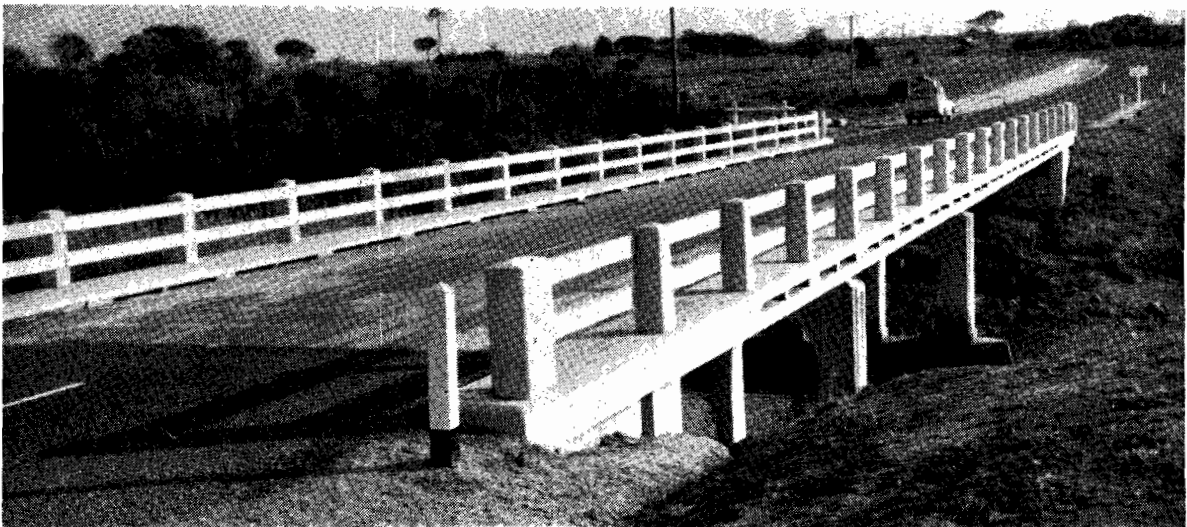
Reconstructed bridge and approaches on South Gippsland Highway over Albert River.
